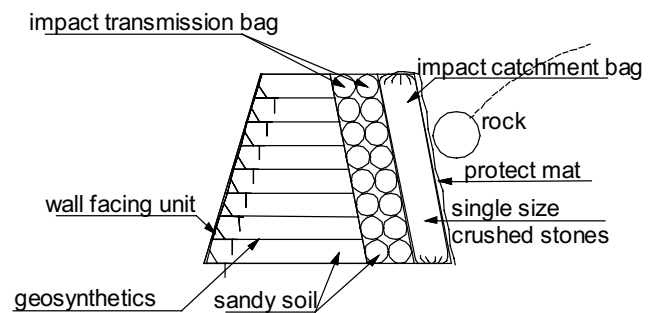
Bank type rock-fall protection retaining wall (conventional type).
